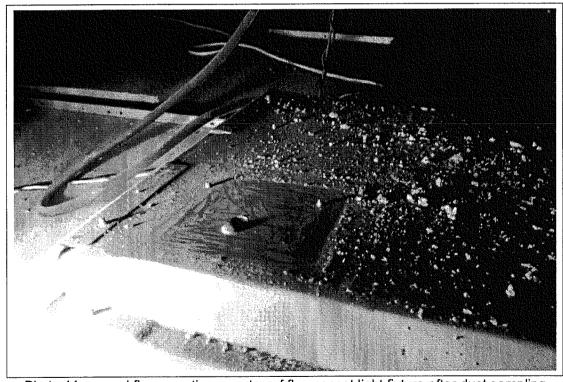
ground floor meeting rm – top of fluorescent light fixture after dust sampling (sample # 1)
